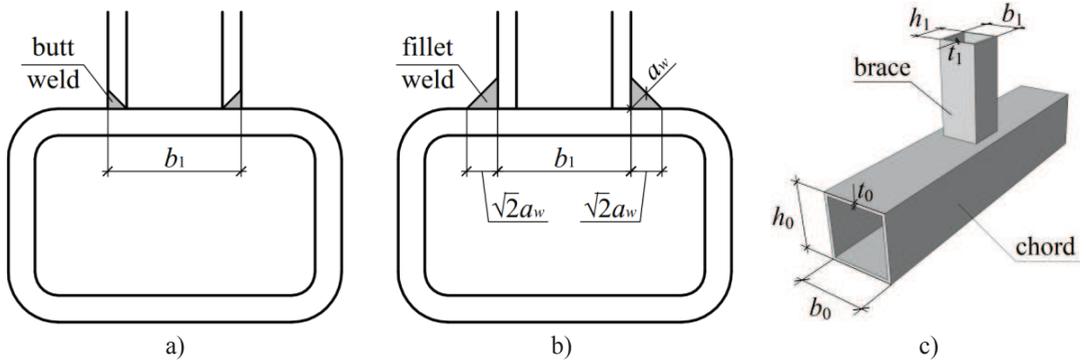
a) Idealized butt-welded joint; b) idealized fillet-welded joint; c) notations of RHS T joint.
